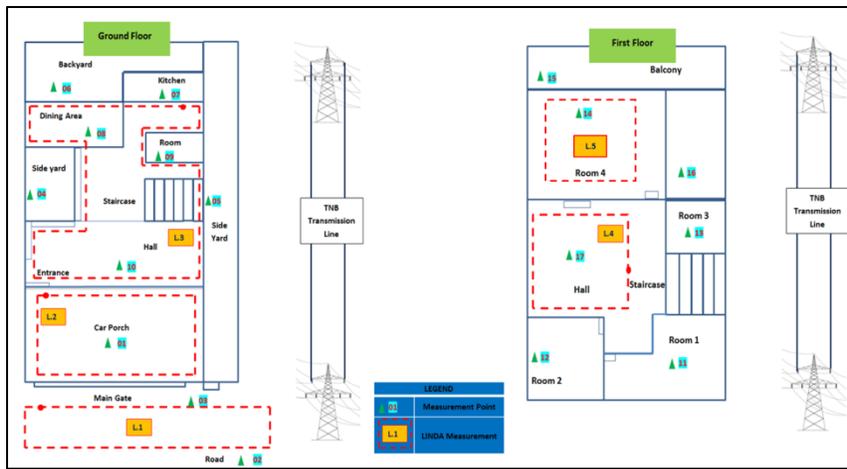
Layout of the measurement point locations inside the house for Case TL2
